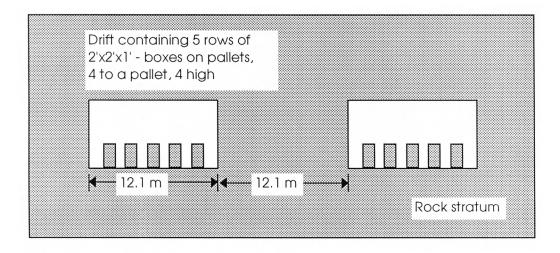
Elevation View of a Mined Cavity with Storage Configuration
